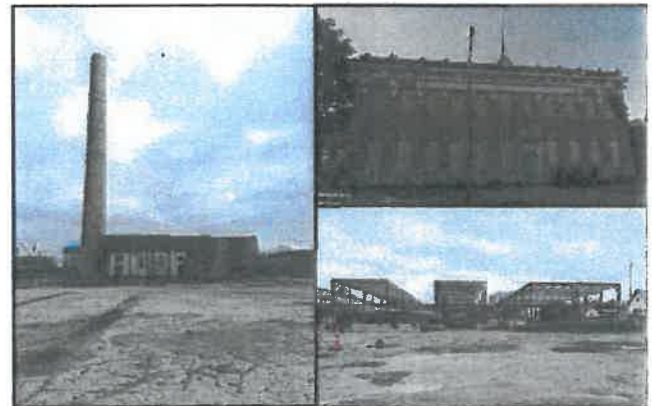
Remnants of Former Houdaille Complex at 537 East Delavan. Note: (Clockwise left to right) Houdaille chimney, Houdaille façade on E. Delavan facing south, remaining steel skeleton. Source: Google Earth (2014); Justyn Bellitto (2020).
